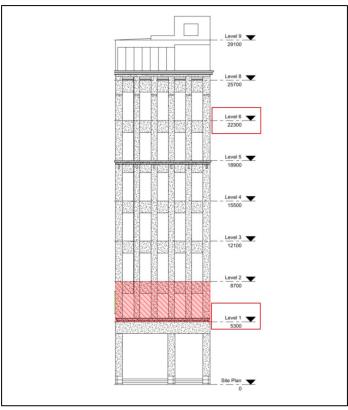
Elevation of host building indicating distance between the basement and Level 1 and Level 6 (Source: site context plans associated with a building and works application TP-2020-553 associated with the Site)
